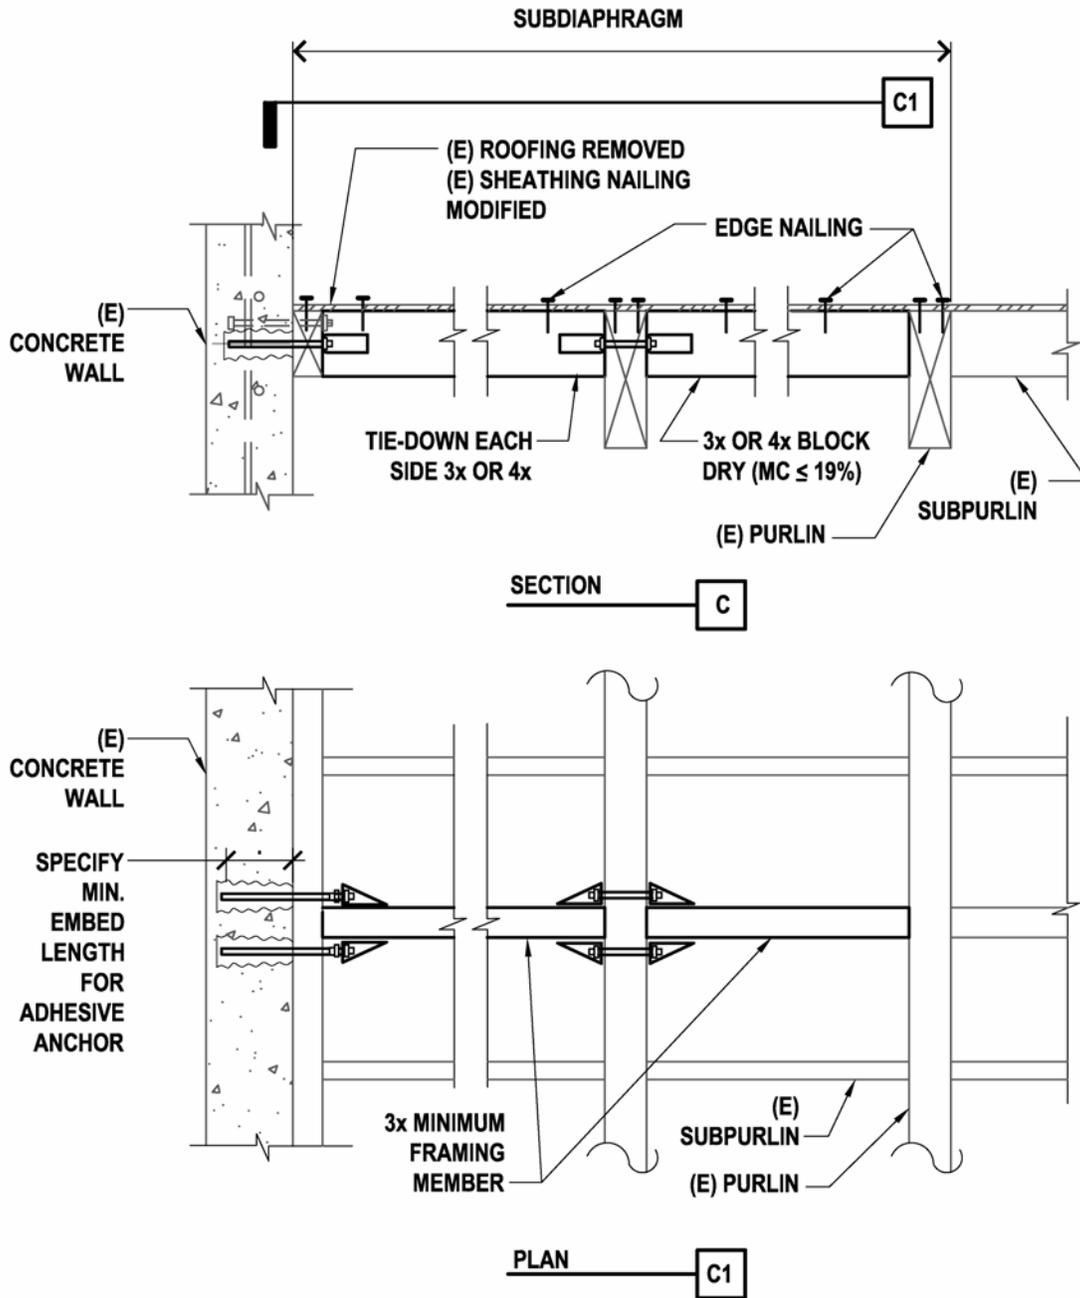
C: Wall Out-of-Plane Anchorage for Flexible Wood Diaphragm at Subpurlins – Roofing Removed
